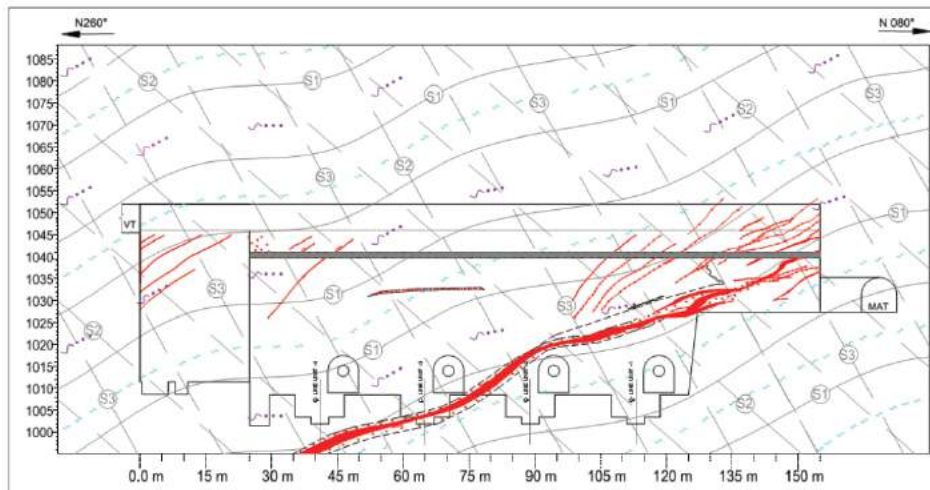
Geological section along upstream wall of power house cavern showing disposition of shear zone
